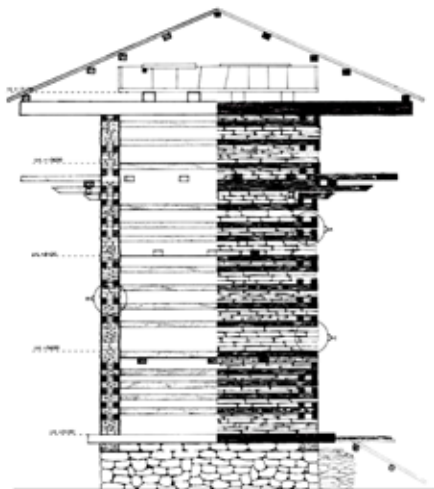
Section and elevation detail (Source: Sharma, N., 2020)
